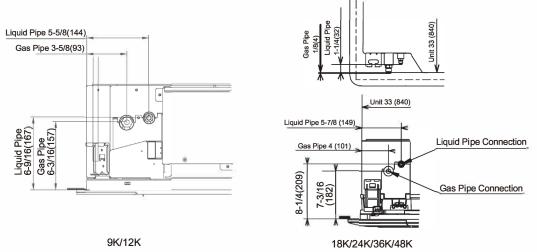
Position of Piping Connection [Unit:in. (mm)]
